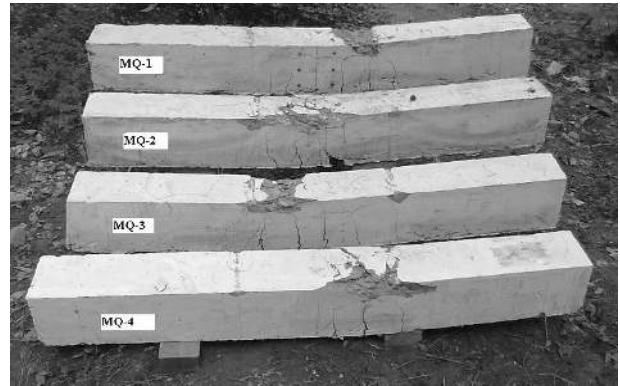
Flexure Failure pattern of High Performance Concrete beams.
